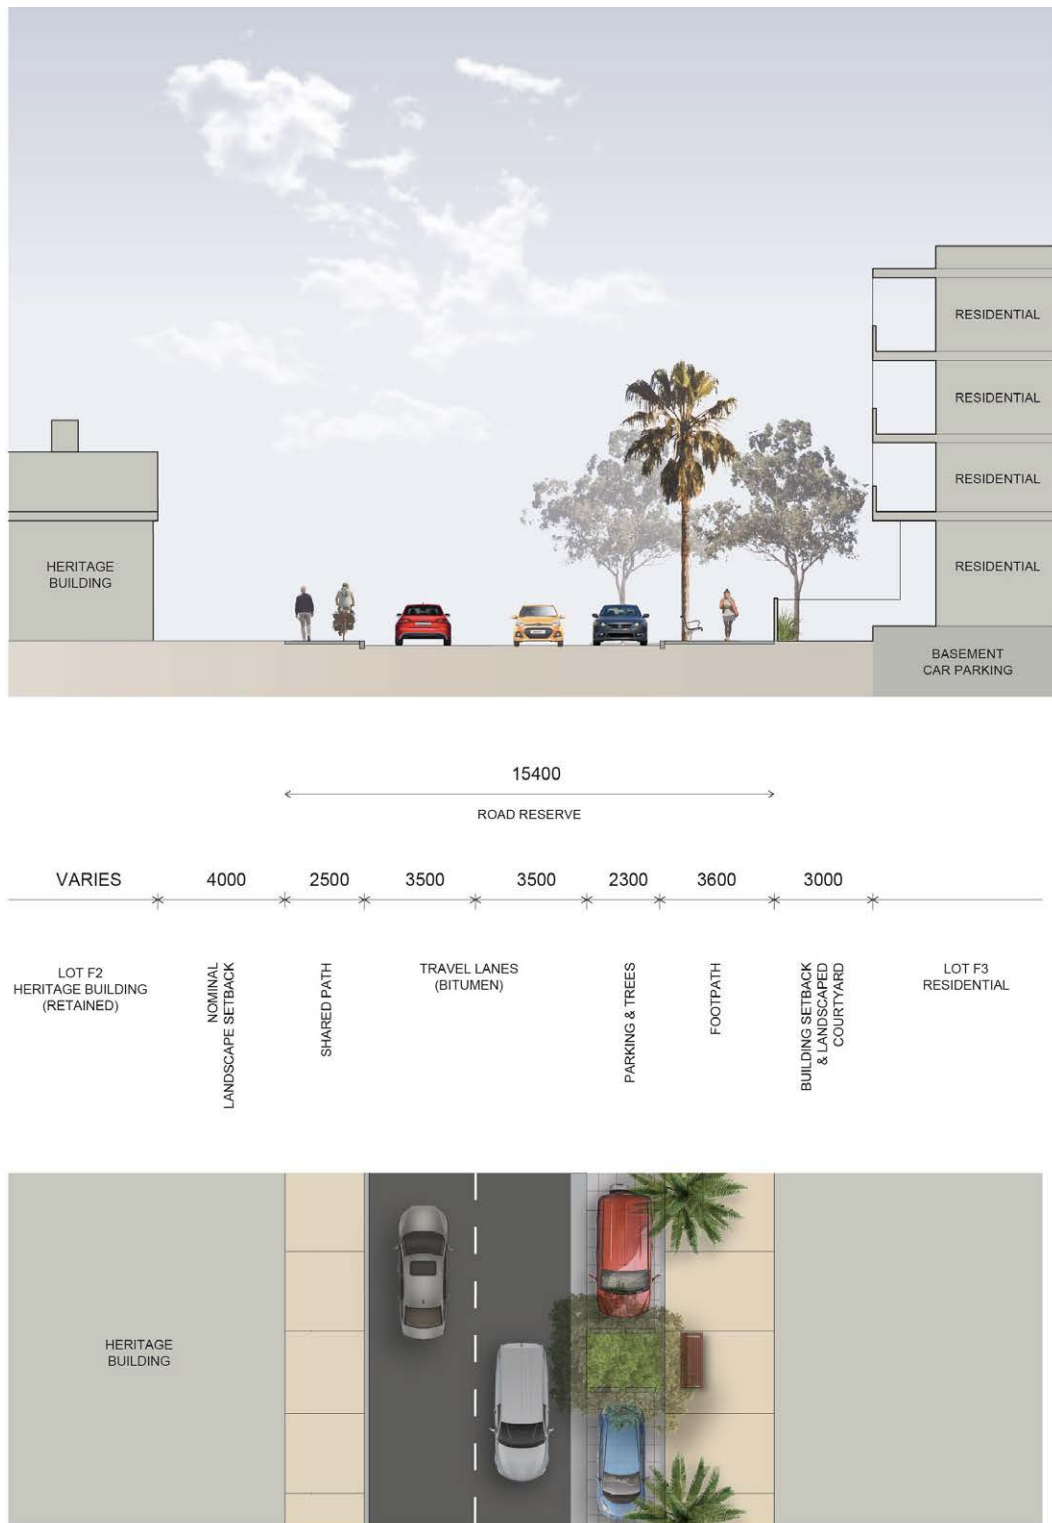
Typical street section 7 – East Circuit (west)
